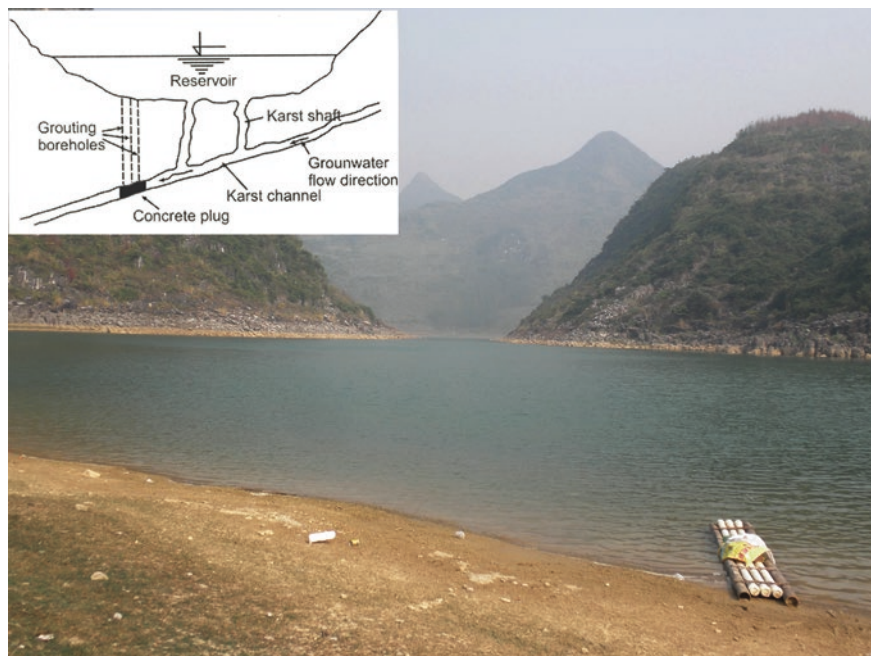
Fu Liulang reservoir, Guangxi Province, China. Surface reservoir established by construction of underground dam. *Upper left* simplified cross-section with position of underground dam. *Sketch and photos* P. Milanović
